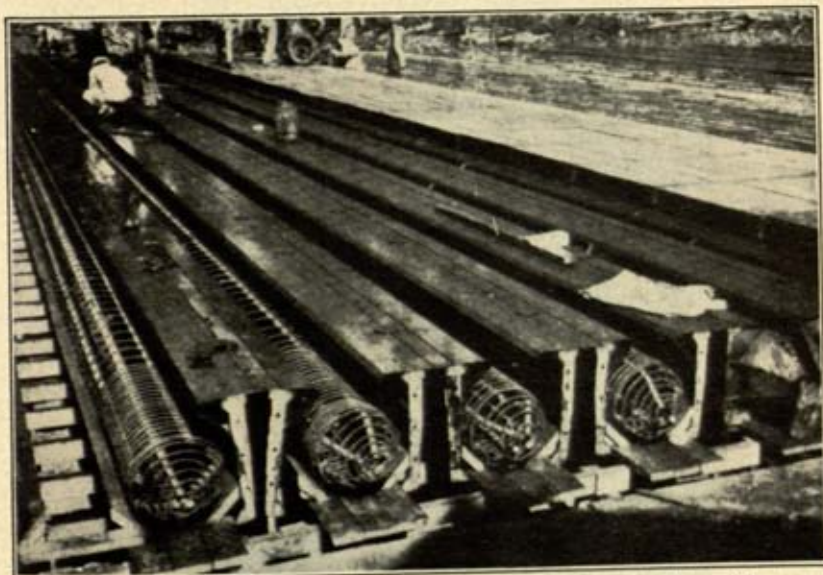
Preparing forms and reinforcing for precast concrete piles. (*Raymond Concrete Pile Co.*)
